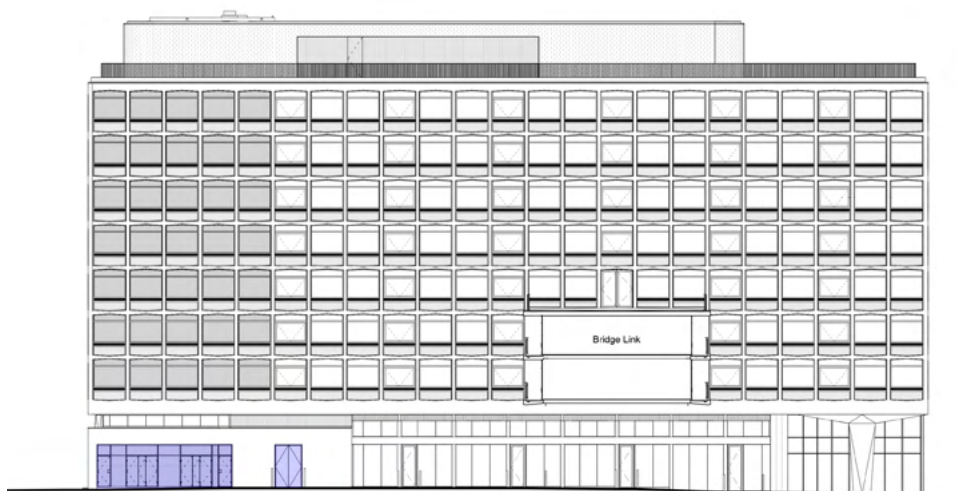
Kingsway East Elevation - MAT 07 location
